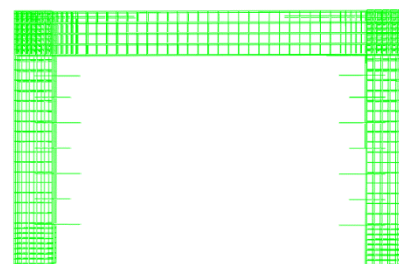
The finite element model of tie bead and reinforced skeleton arrangement
